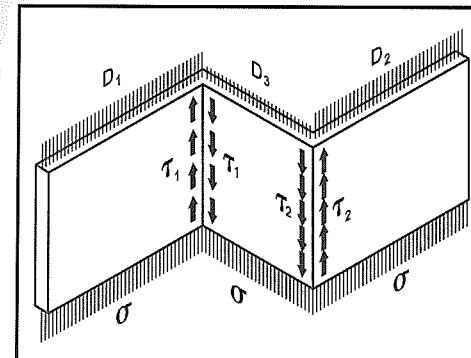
Normal And Shear Stresses In Wall Subjected To Non-uniform Vertical Load
